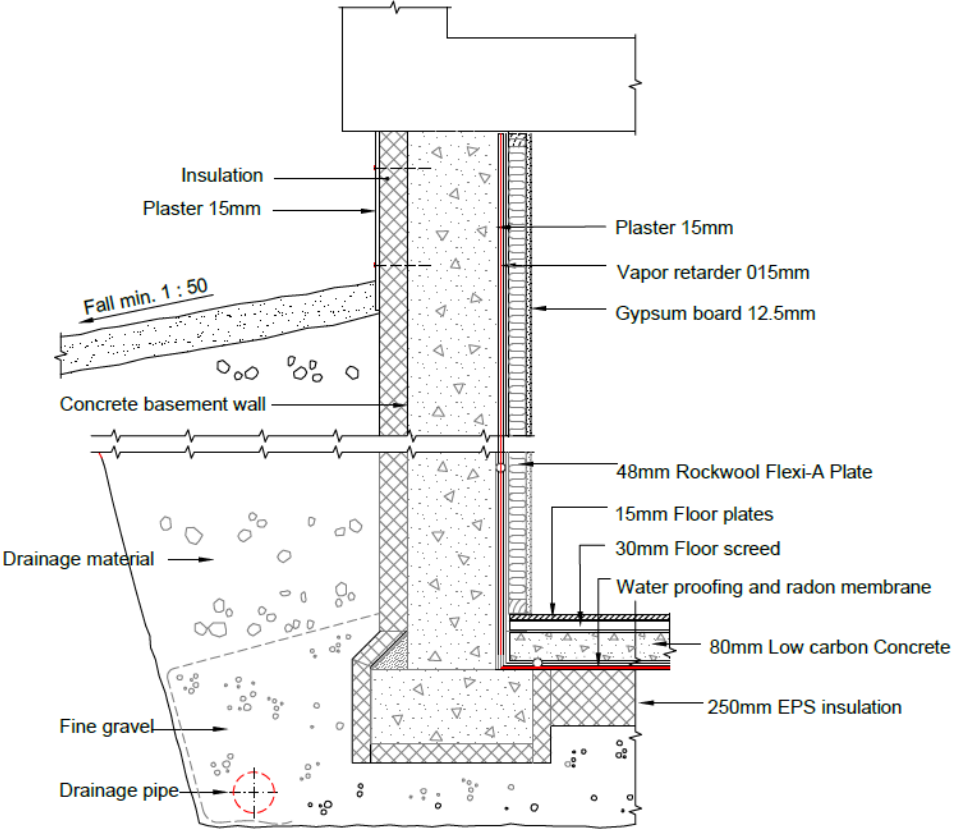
concrete floor at basement detail (Byggforsk TEK17)
